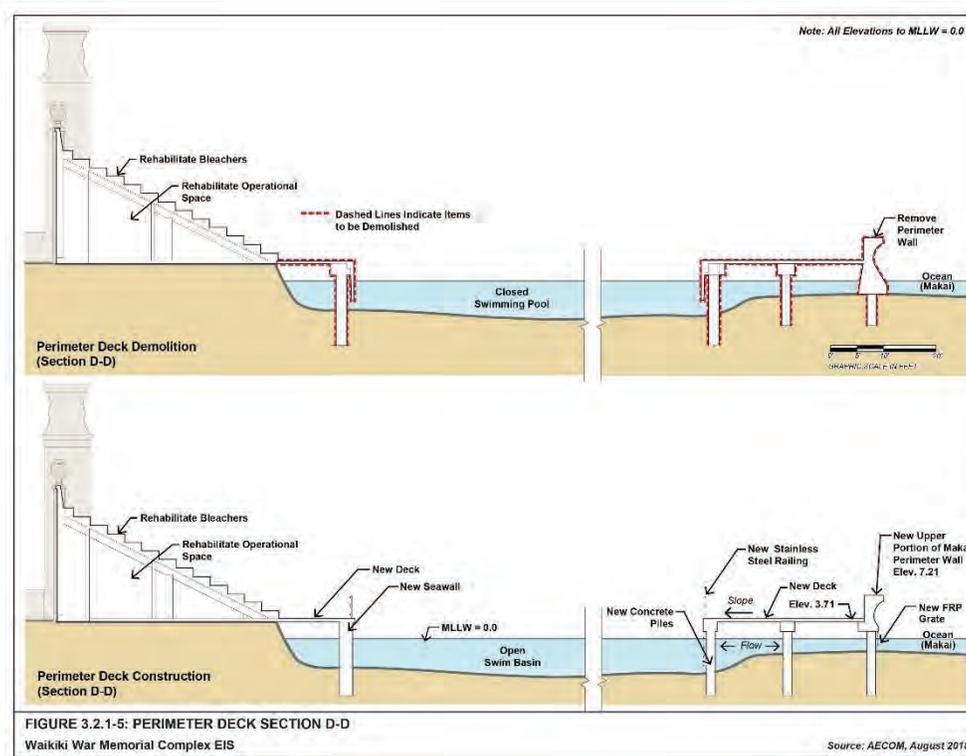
Alternative 1 – Perimeter Deck, section view D-D.
